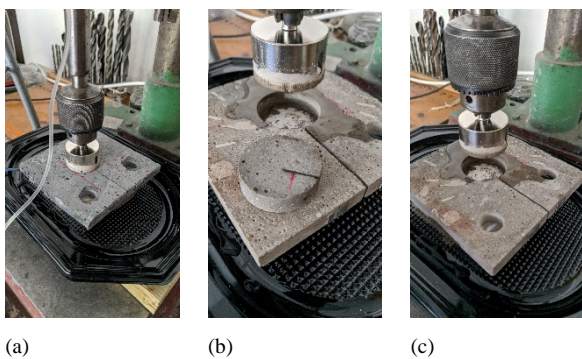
CT specimen notch base sample drilling process, RTU lab
